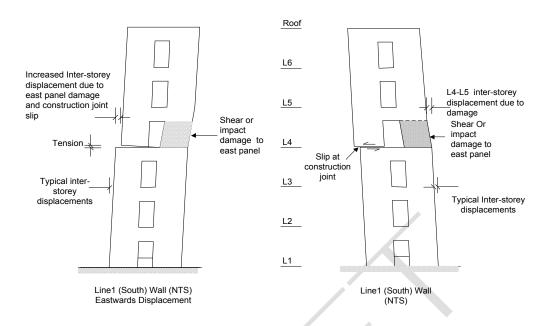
Shear or impact damage on L:ine 1 shear wall at Level 4 to 5
